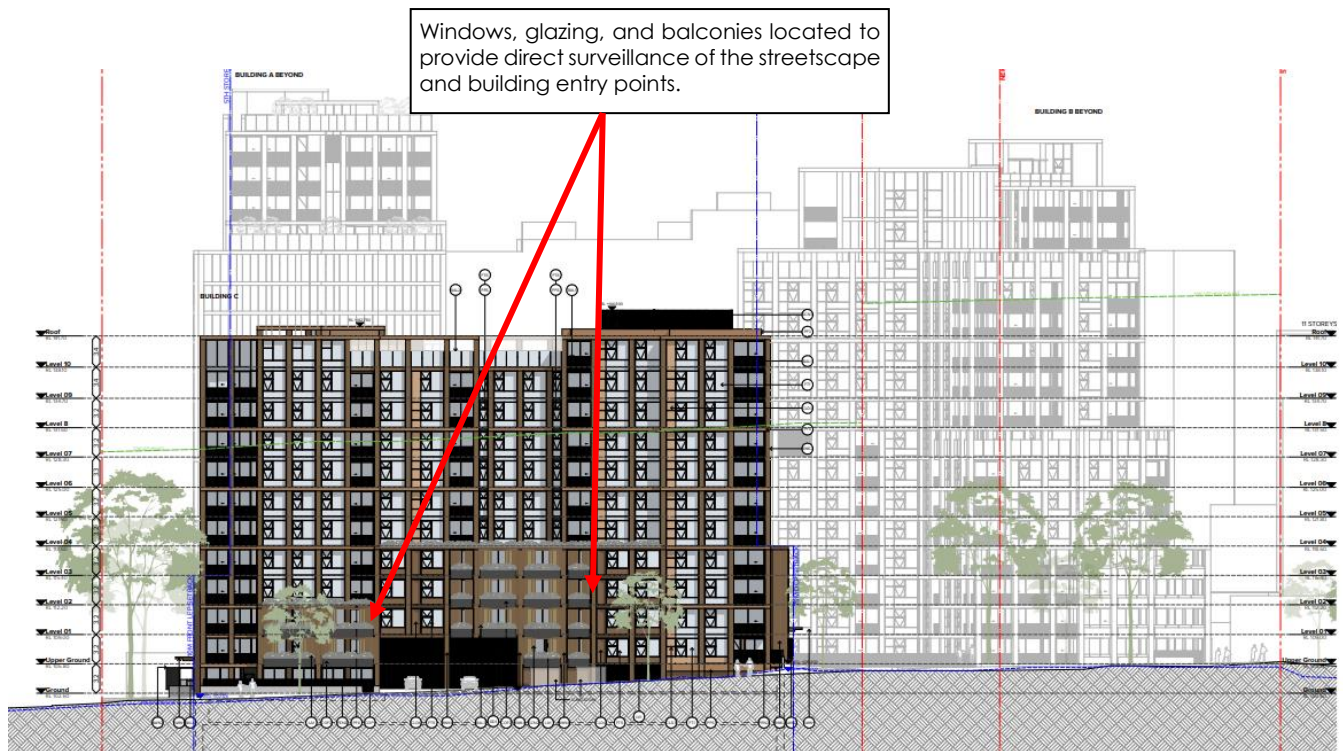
Extract of elevation plan for Fishburn Crescent (Turner Studio, 2025)
